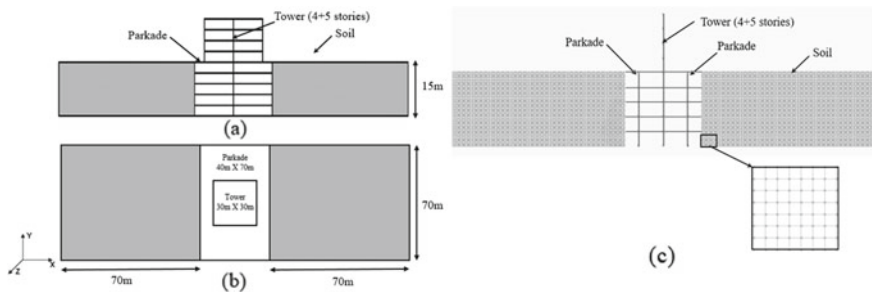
a Elevation b Plan of the 9-storey building c Analytical model
